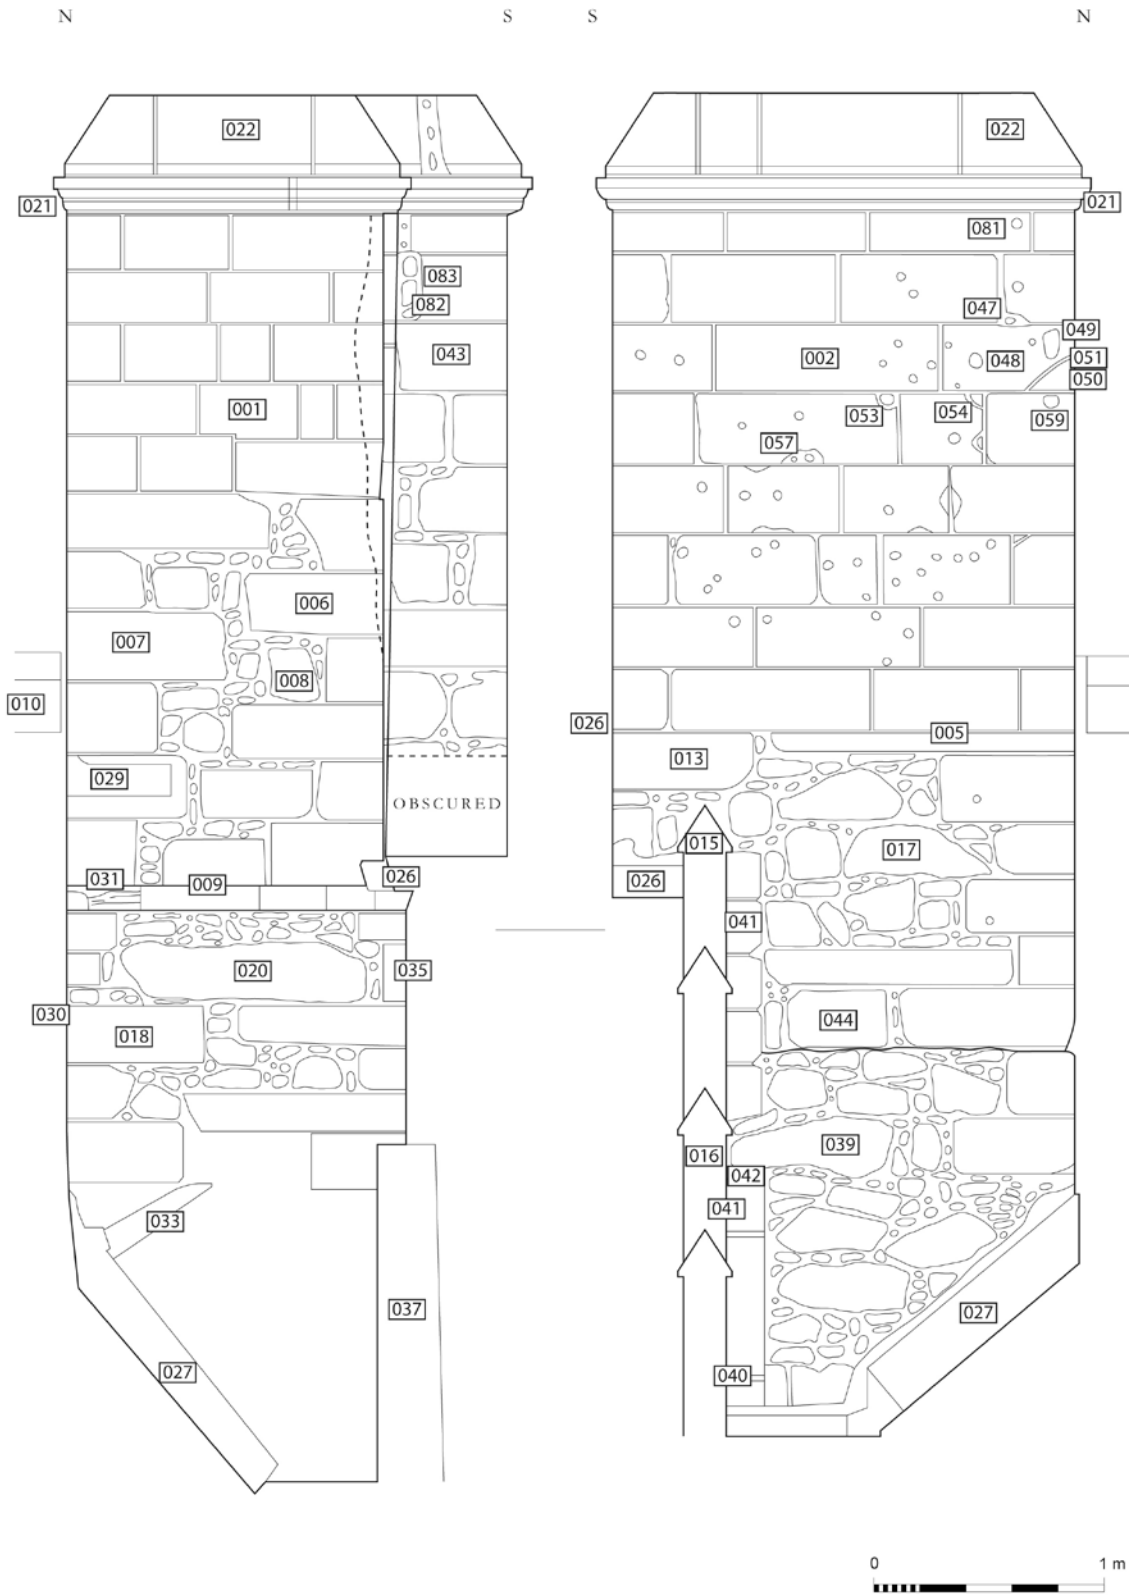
Chimney RC11, western elevation (left), and eastern elevation.
